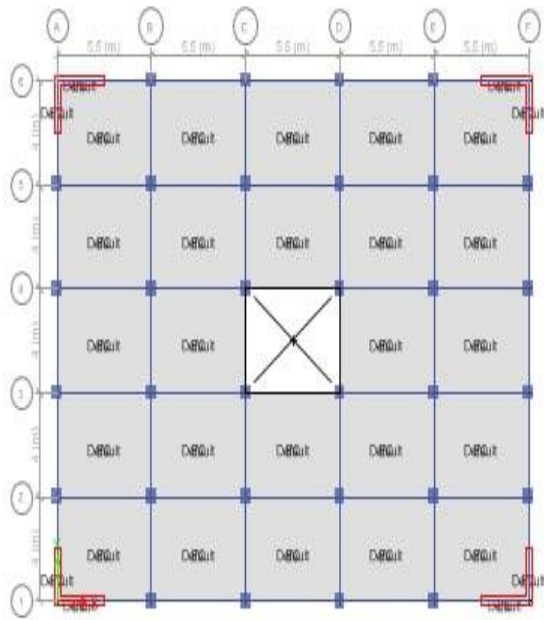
3 G+5 building with Shear wall location at edge with opening
